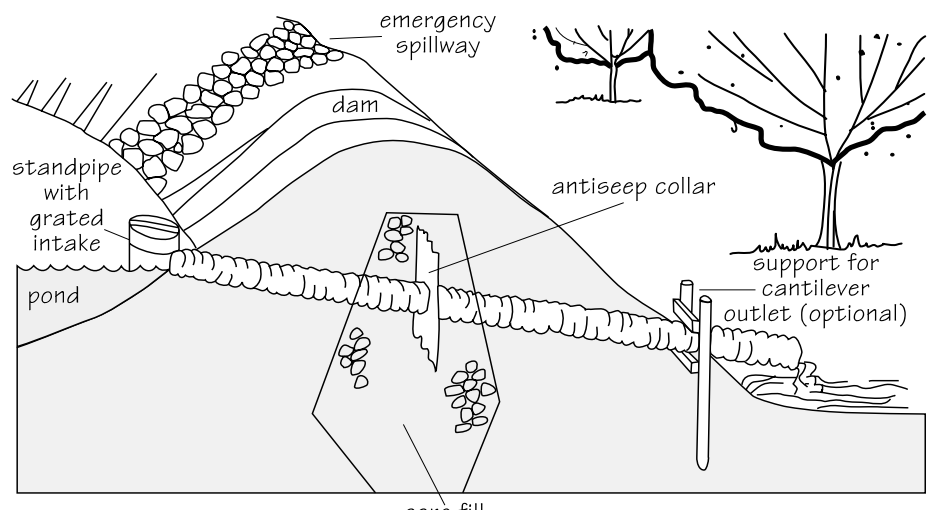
Section through a berm showing standpipe with antiseep collar. (Modified from U.S. Soil Conservation Service, 1982.)
